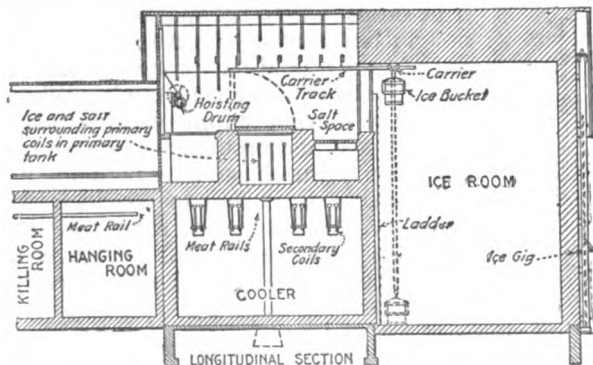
Lengthwise section through the same house which is cooled by brine and constructed as part of a small slaughter house.
